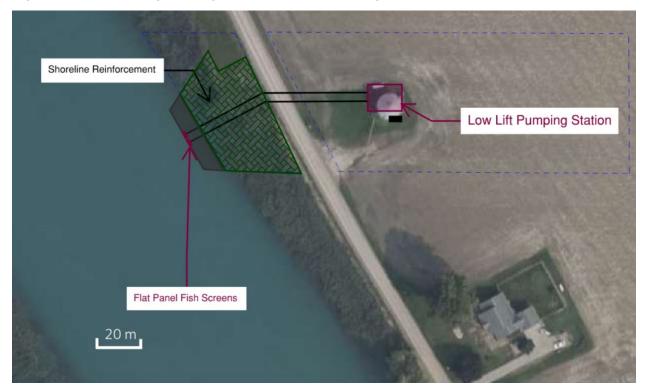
Preliminary Site Layout for Alternative Design Concept 3
